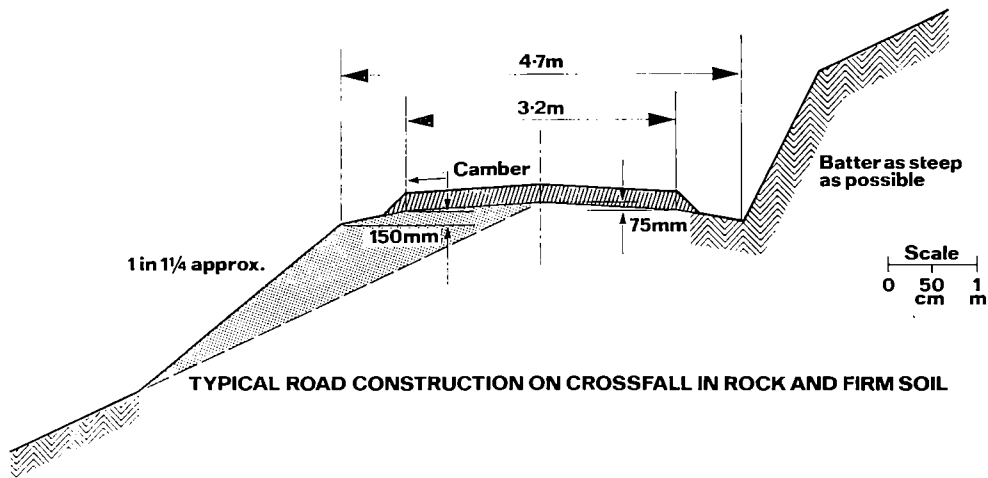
Cross section through a typical road on a crossfall in rock and firm soil.
